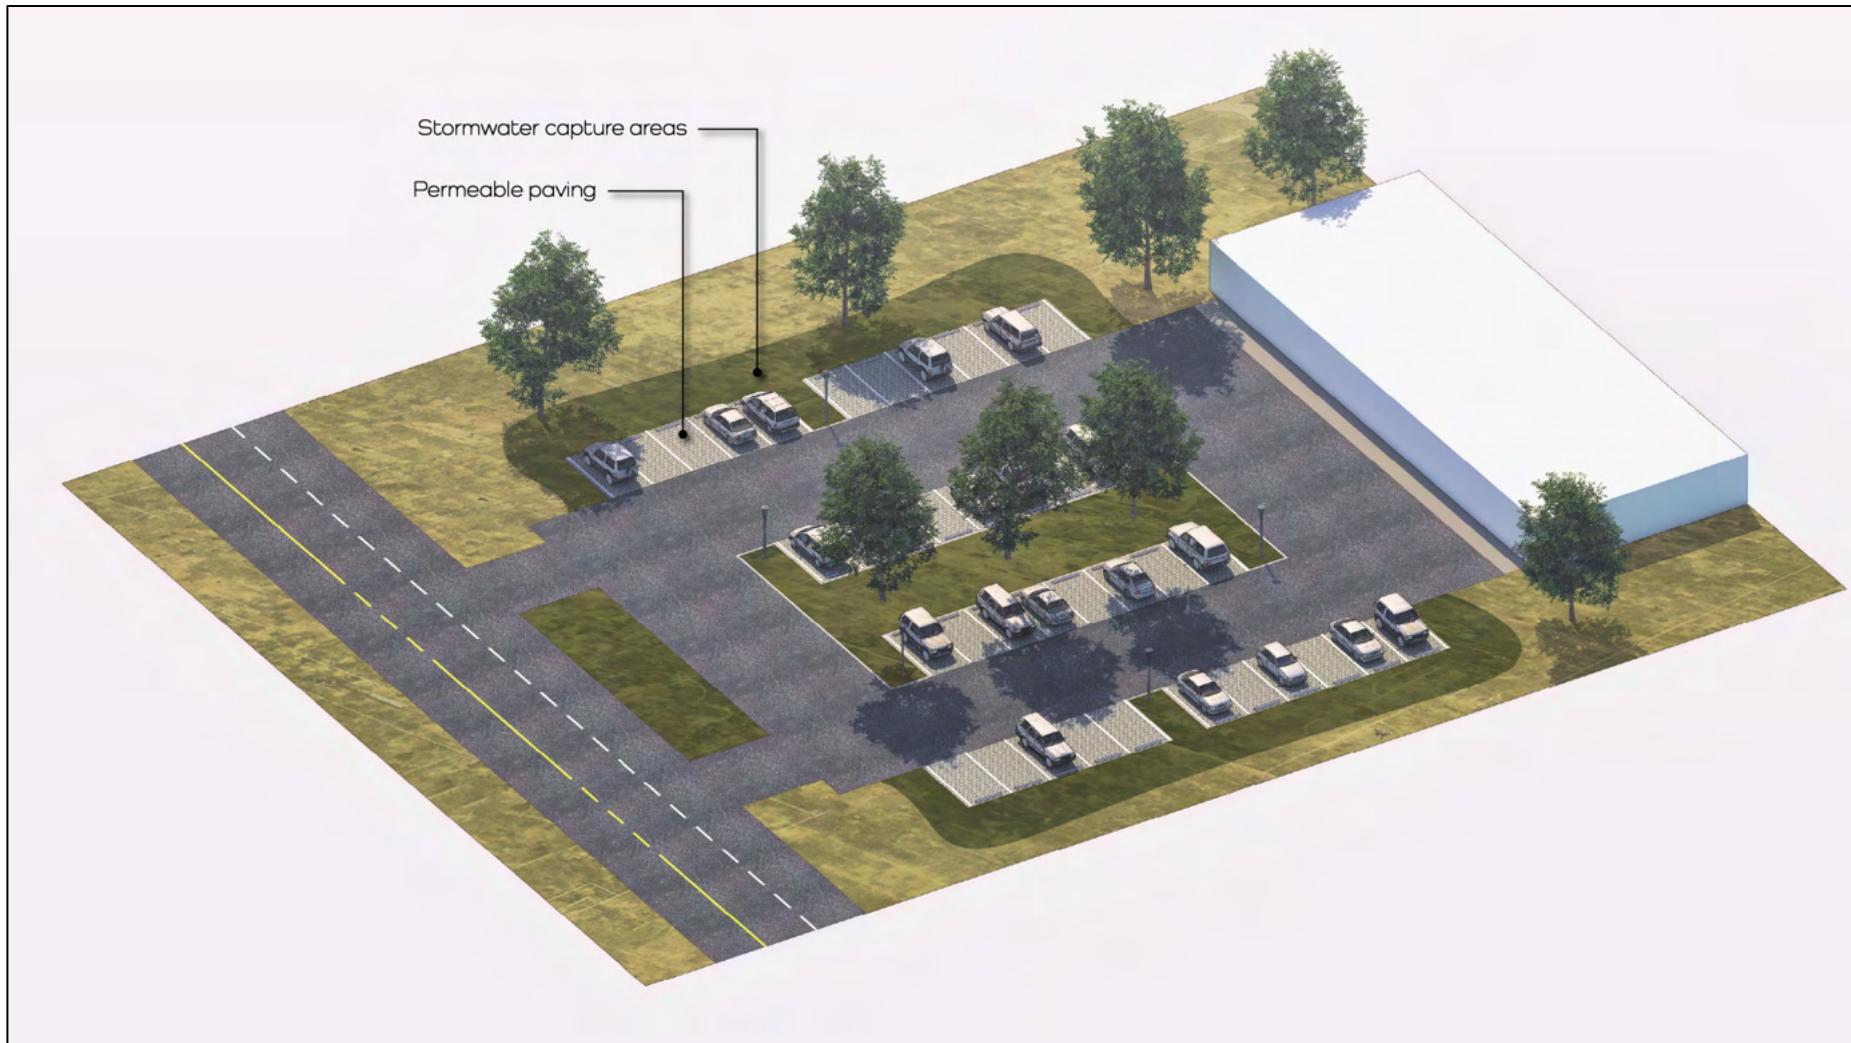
Example Parking Lot Enhancements – Stormwater (Conceptual)
